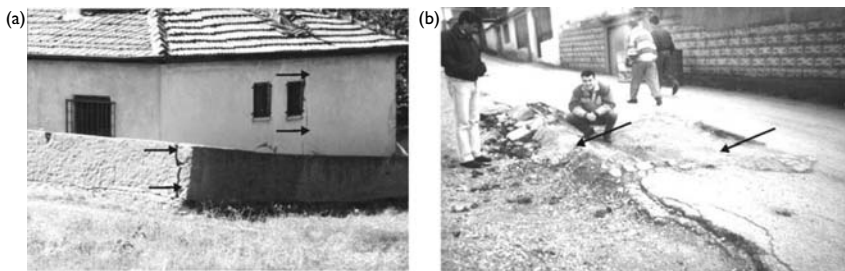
(a) Damaged garden wall due to differential heave of the clay, and (b) excessive heave and cracking of the asphalt pavement caused by reactive soil.
